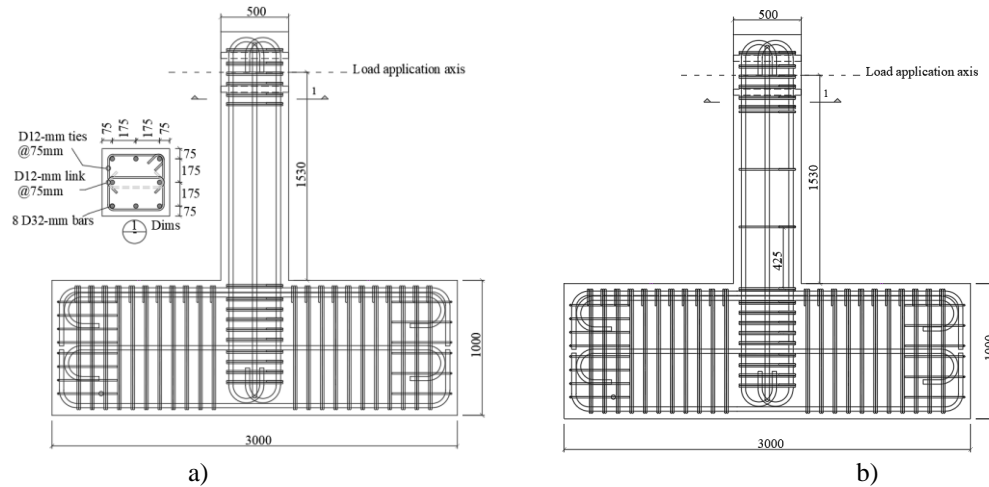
Details of the specimens tested at UC: a) Columns C3, C9, and C10, b) Column C11
